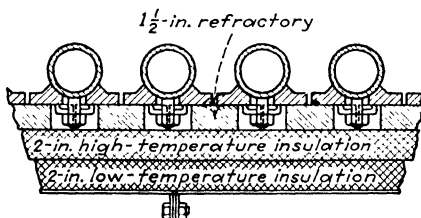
Waterwall tubes backed with cast-iron blocks bolted to the tubes, refractory, insulation and steel casing. (*Foster Wheeler Corporation.*)
